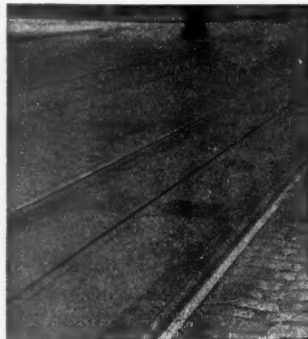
Same Pavement Laid with Marginal Protecting Strips.
